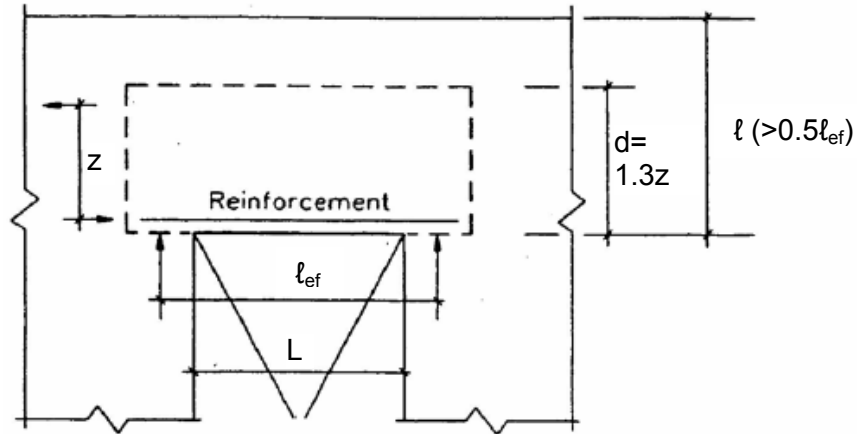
Geometry of beam-type masonry element subjected to in-plane shear.
